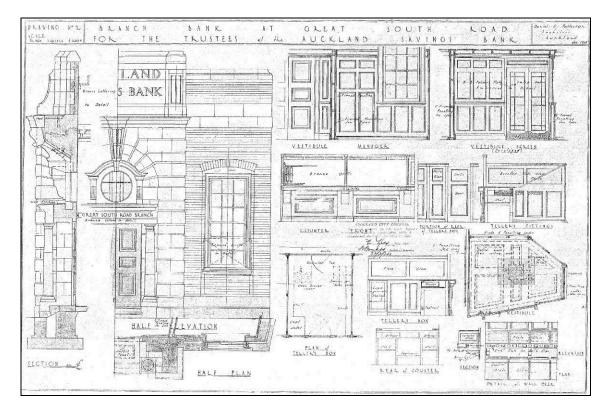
Auckland Savings Bank – Great South Road – 1934 Façade details and Interior elevations. Drawing No.2. Auckland Council Filenet. Accessed May 2016.
